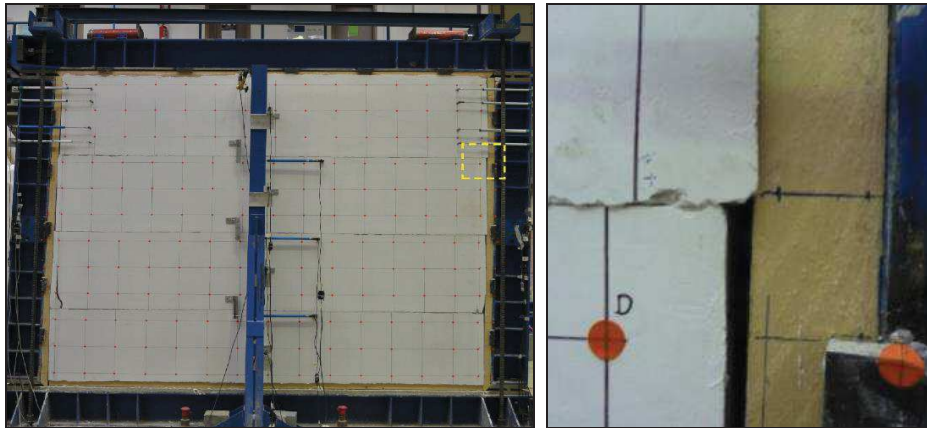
Left: Wall specimen at 2.5% drift; Right: detail of the compressive strain in the contact area between masonry and plank at a sub-portion corner (Preti et al. 2014).
